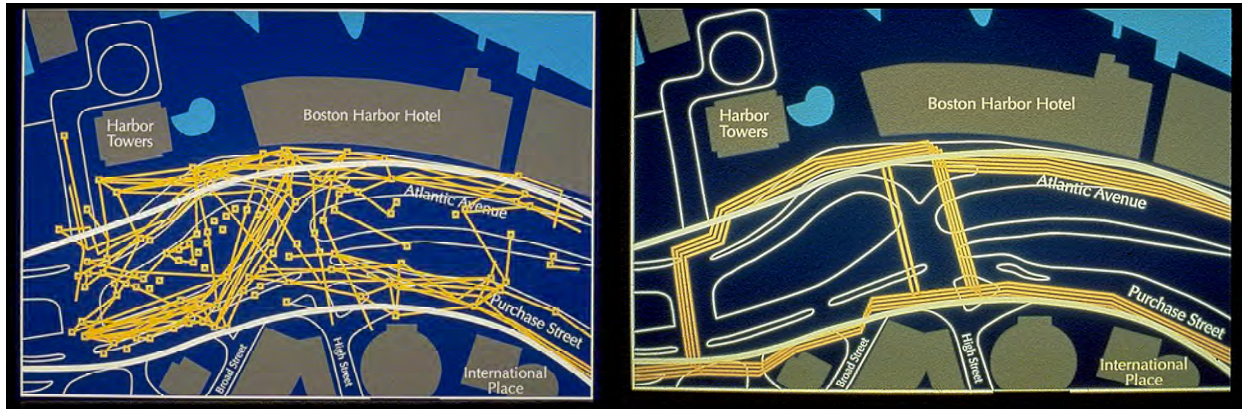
Utilities Before and After Cut and Cover Tunnel Construction at one of Boston Central Artery contracts.
